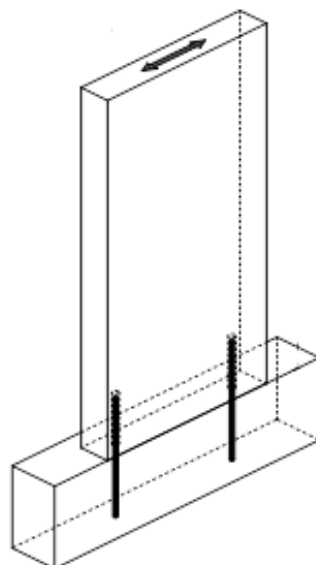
“Rebar type” connection between panel and beam (one half of the panel is shown).
